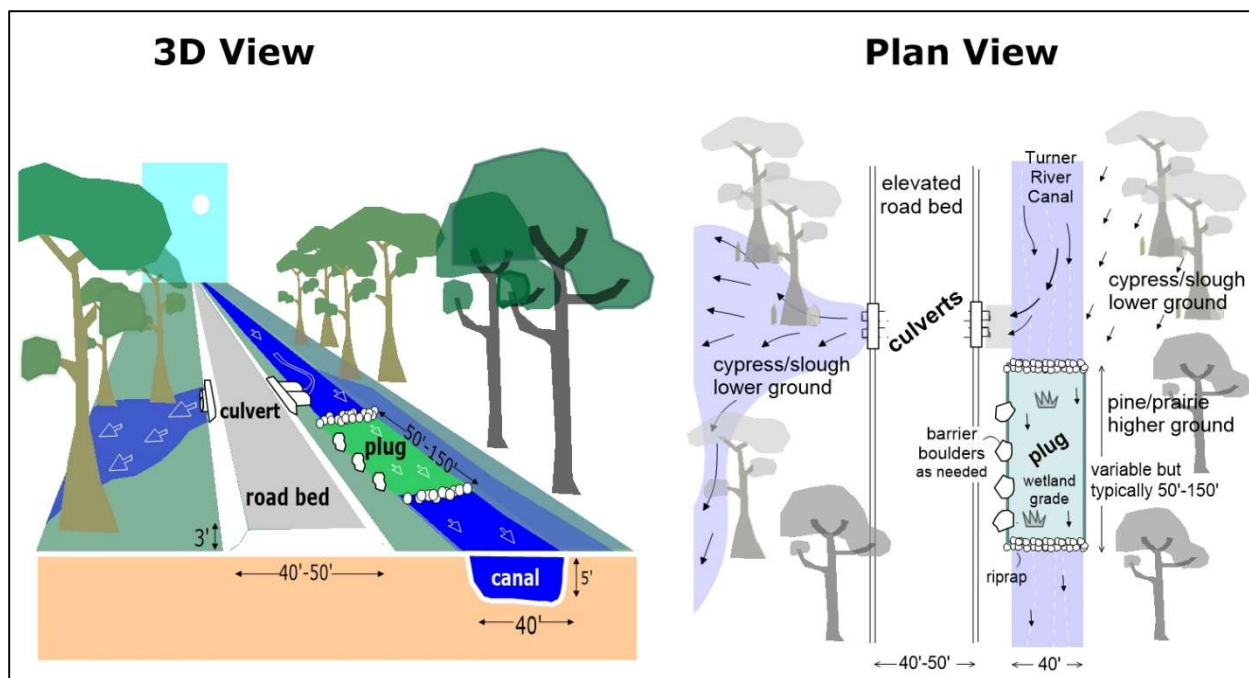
3D and Plan Views of a Typical Culvert/Plug Pair
